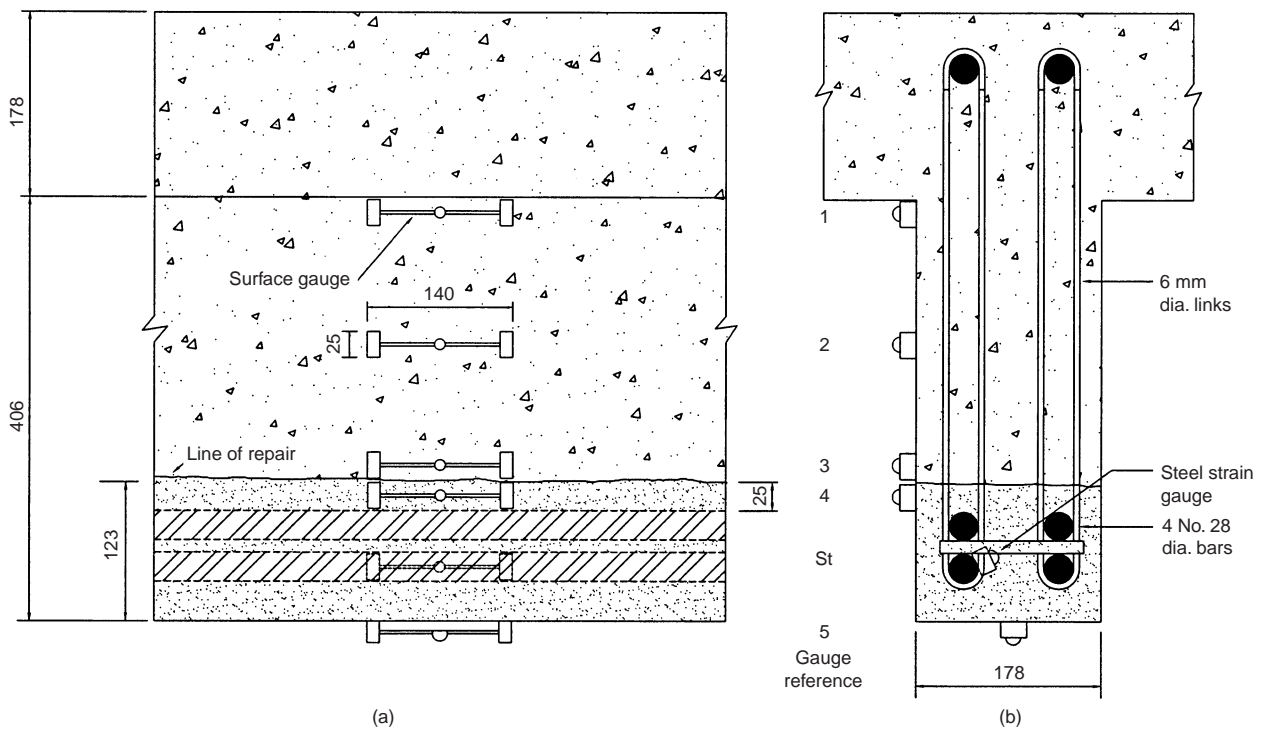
Section details of lateral beams at Gunthorpe bridge, with location of gauges: (a) elevation; and (b) cross-section (all dimensions in mm)
